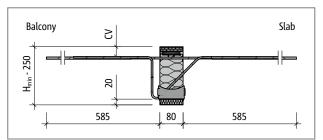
Schöck Isokorb® T type K-M1 to M4: Product section
